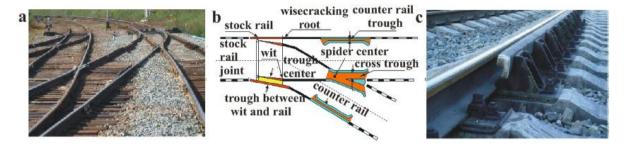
Basic elements of turnout: (a) main view; (b) scheme; (c) counter rail with bearing plates.
